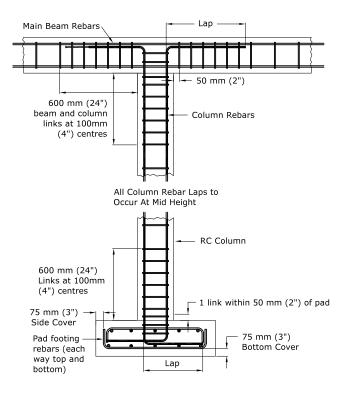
RECOMMENDED DESIGN FOR PAD FOOTING AND COLUMNS
